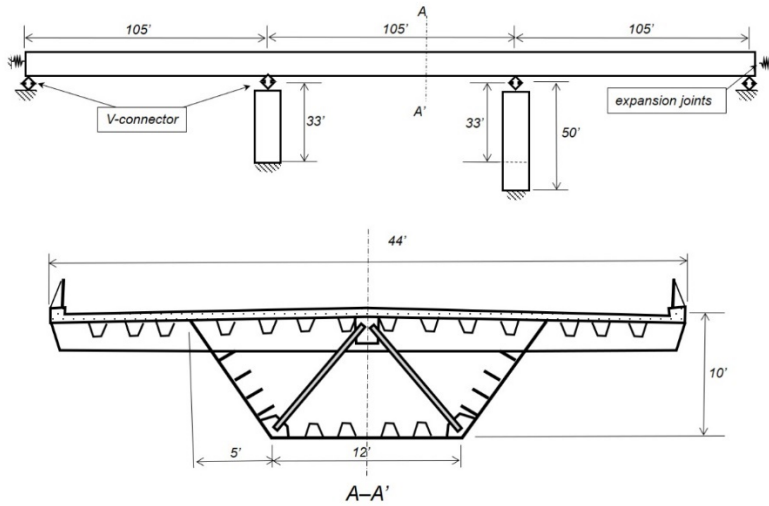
Benchmark railroad bridge II: three-span continuous orthotropic box-girder bridge
